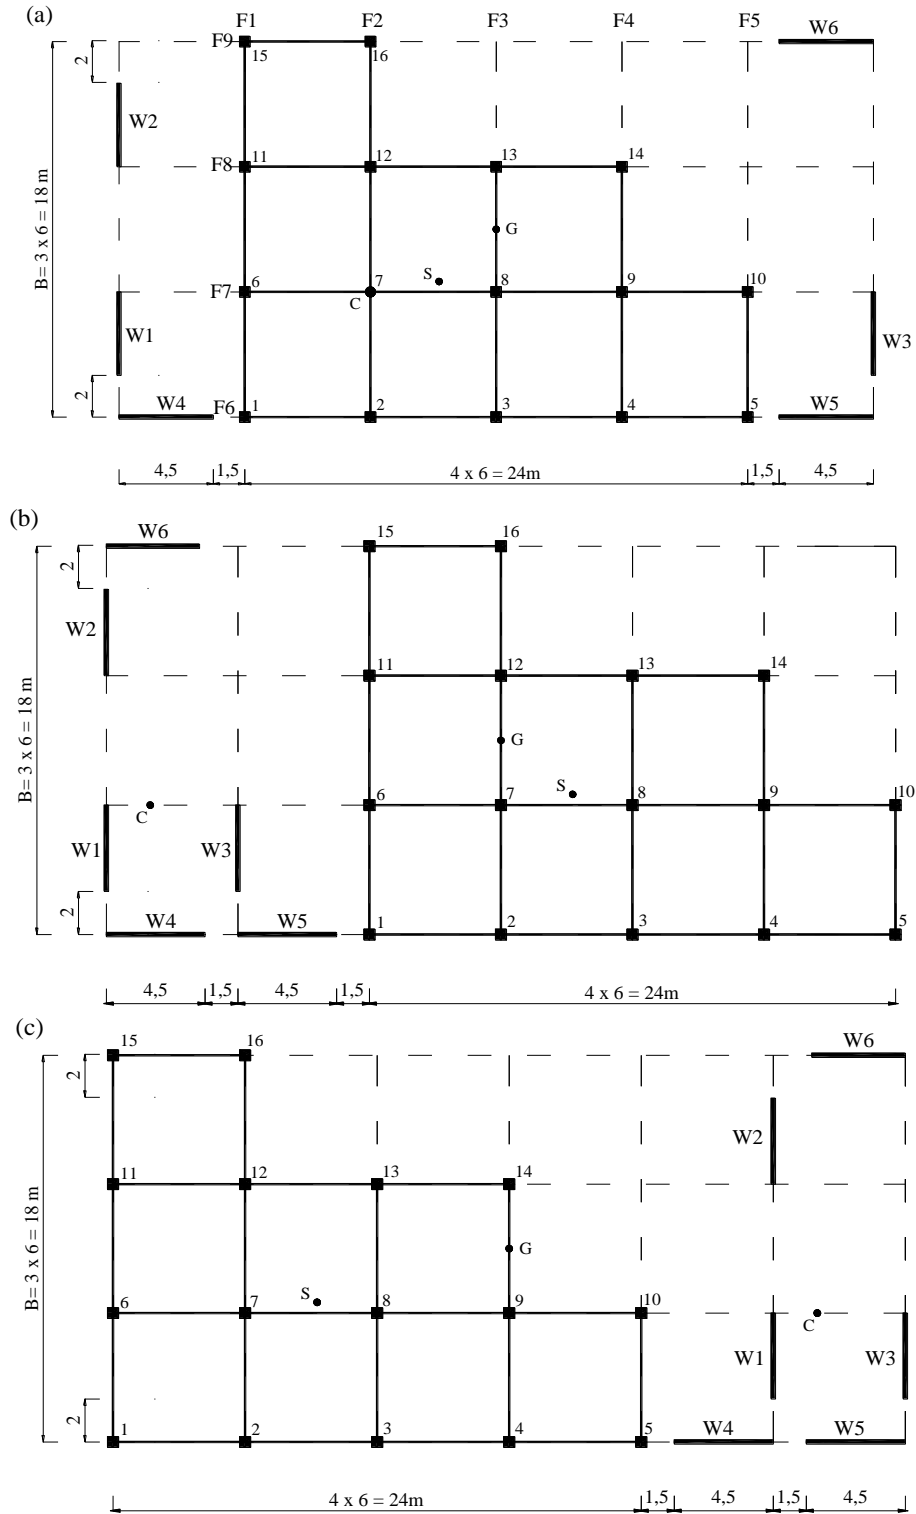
Floor plan of the considered structures; (a) Floor plan1; (b) Floor plan2; (c) Floor plan3
